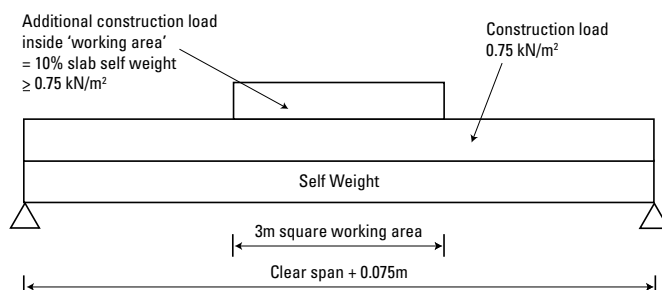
SCI's recommended construction loads on decking during casting of concrete
